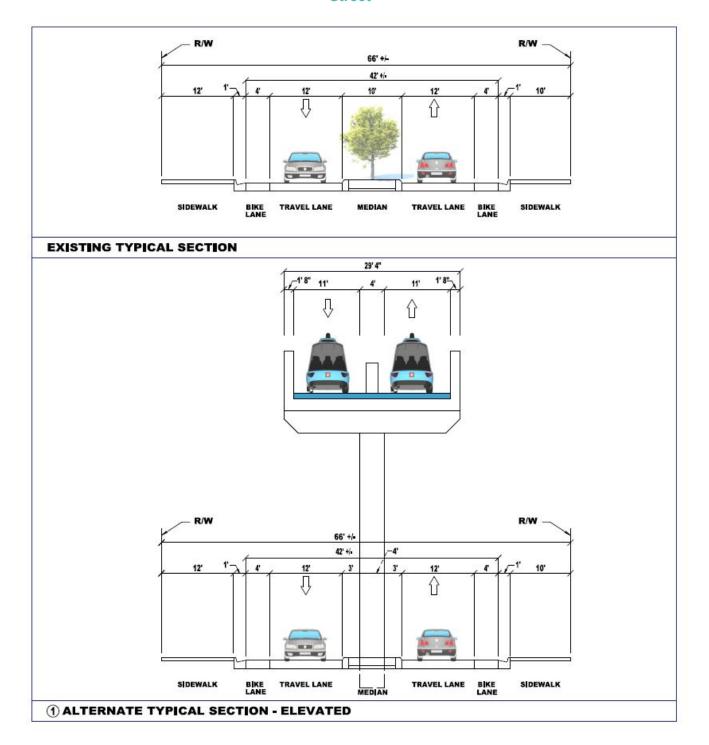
North Corridor Existing and Alternate Elevated Typical Section - W. 8th Street
